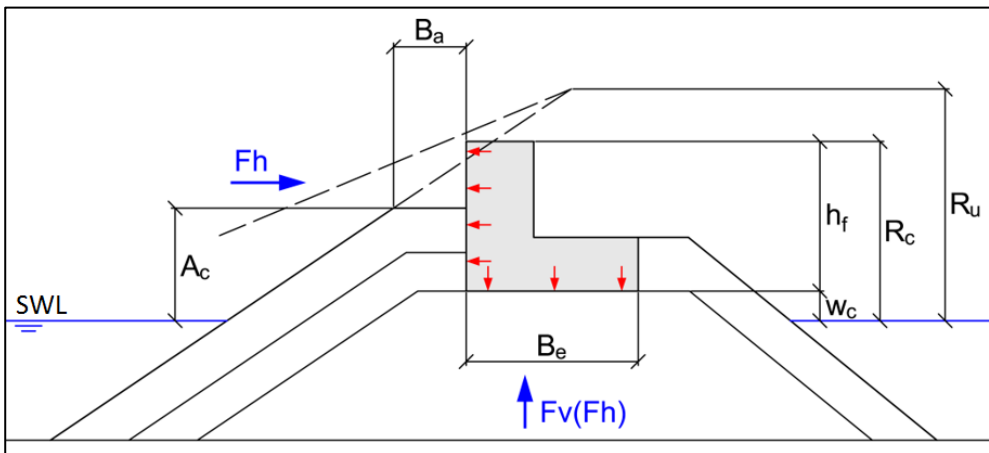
Scheme of horizontal and vertical up-lift forces acting on the crown wall.
